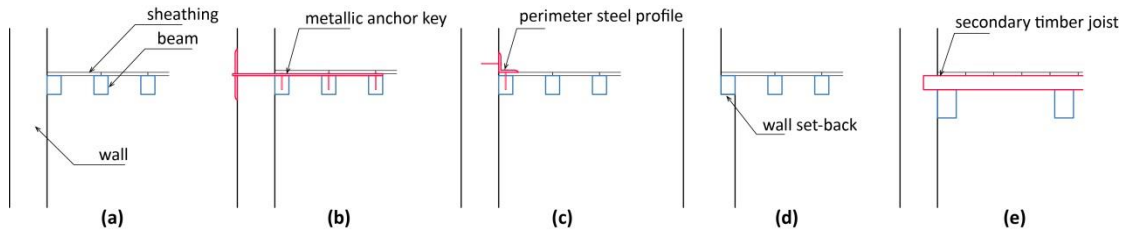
(a) Lack of connection between the beams and the parallel walls; (b) metallic anchor keys anchoring the beams to the walls; (c) use of perimeter steel profiles; (d) beams resting on the set-back of the wall; and (e) secondary timber joists partially embedded in the wall (Ortega et al. 2018)
